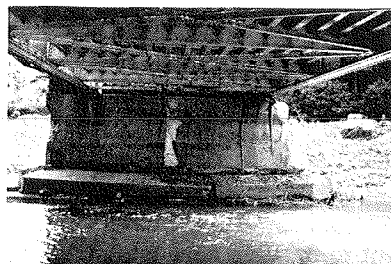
Front view of cracked pier shaft and broken pier footing.
